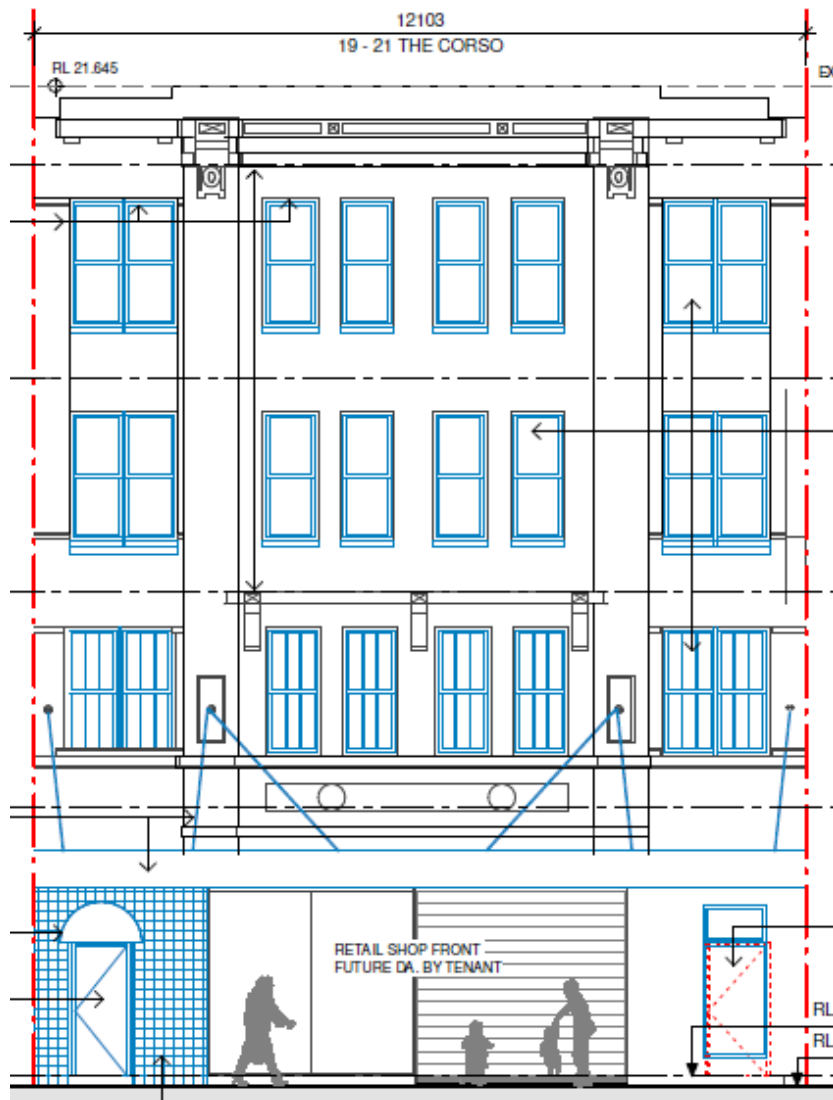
Proposed Elevation to The Corso. (Source: NBR Architecture)
